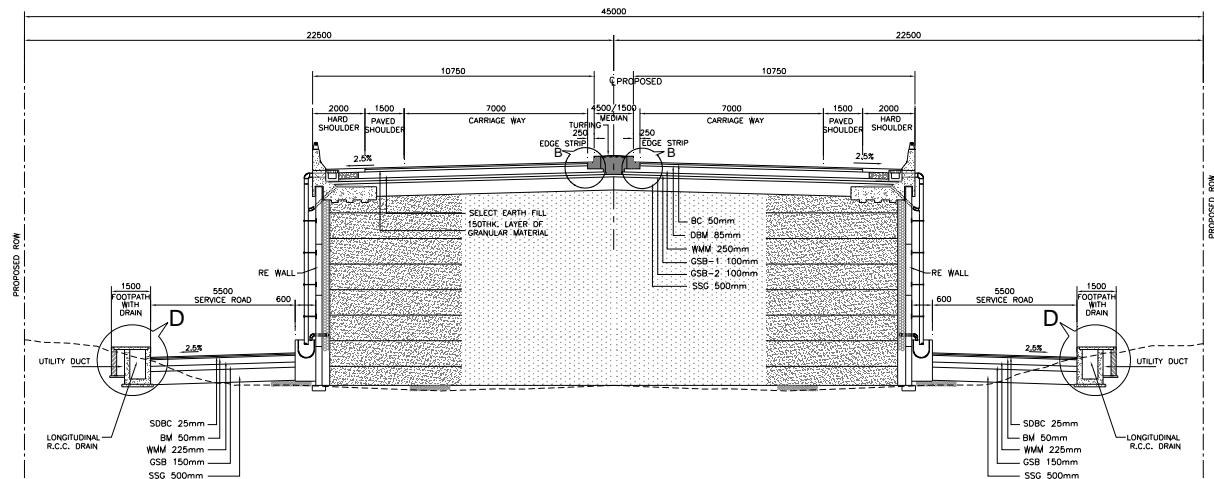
TYPICAL CROSS SECTION AT UNDER PASS LOCATION
